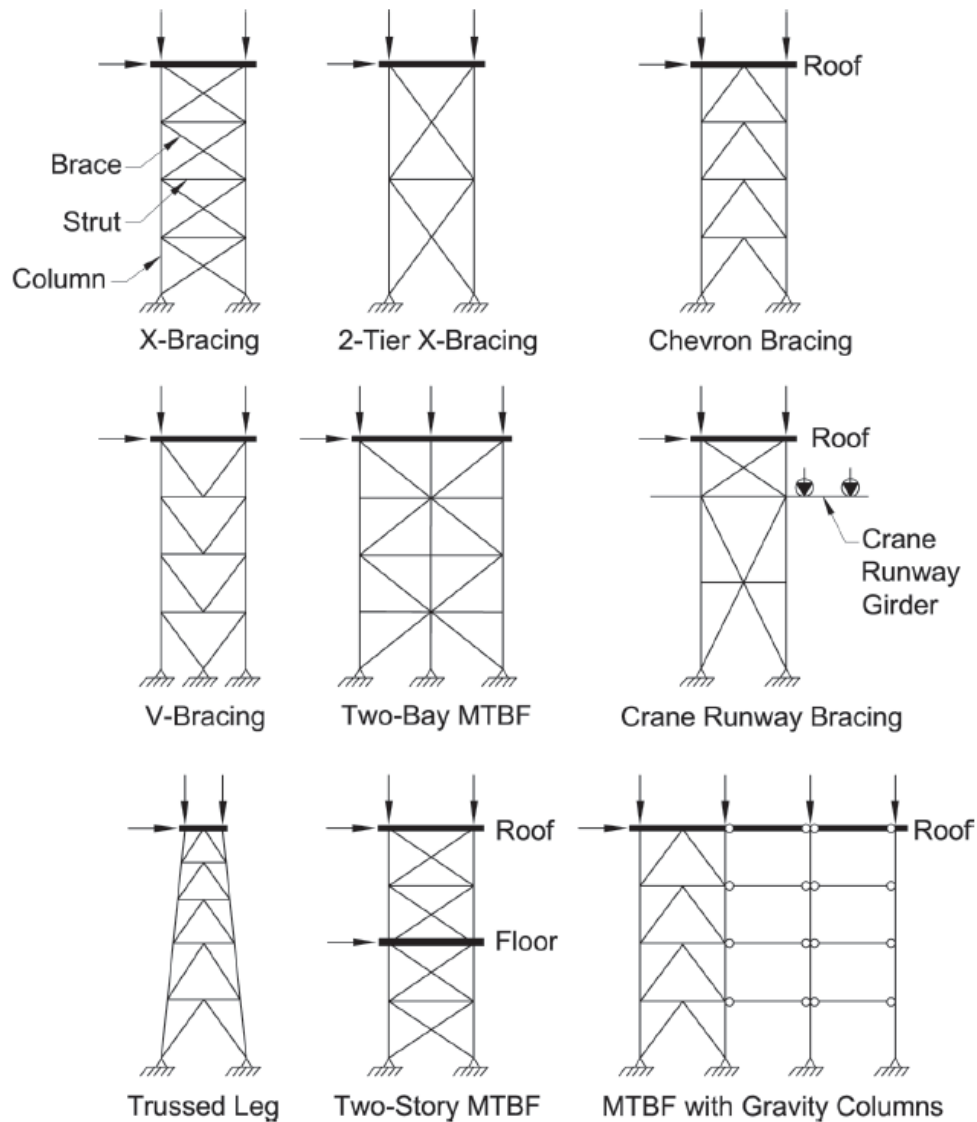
Typical MT-CBF configurations (American Institute of Steel Construction, 2016a)
